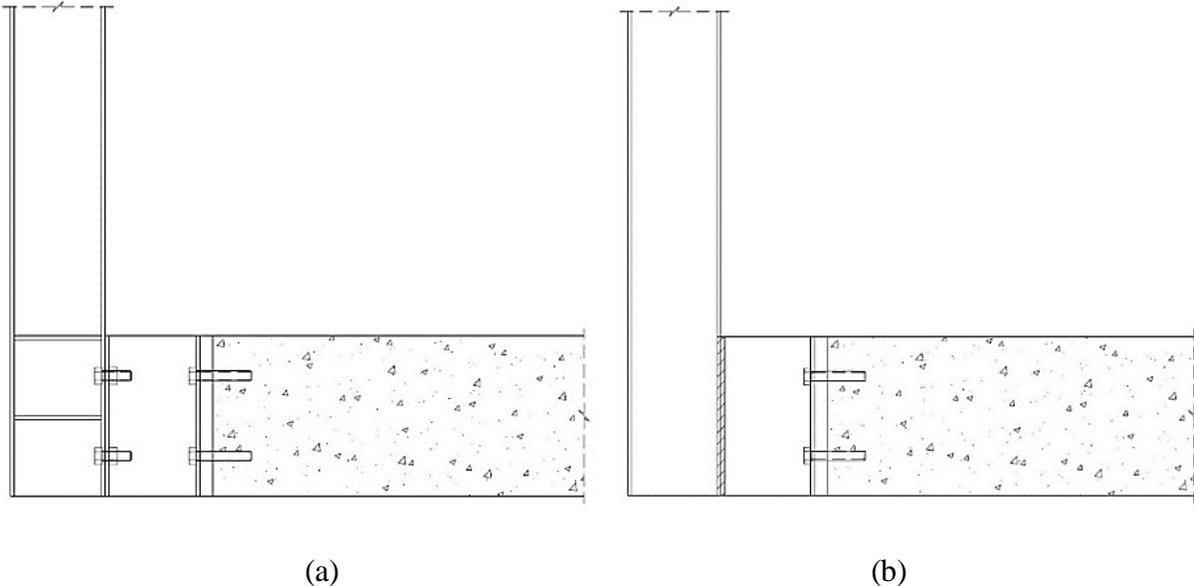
Post Spacer Comprising: (a) Independent Pieces, or (b) Welded Post Assembly
